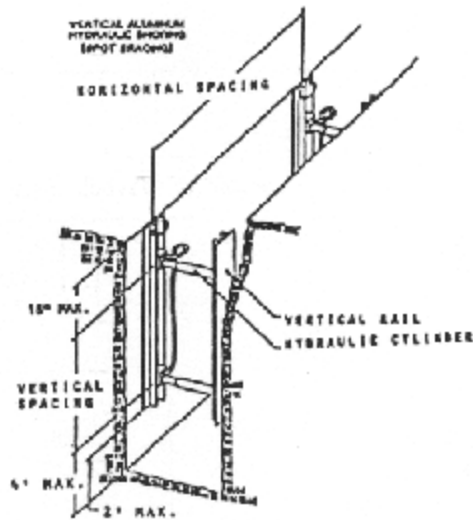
Vertical aluminum hydraulic shoring (spot bracing)
